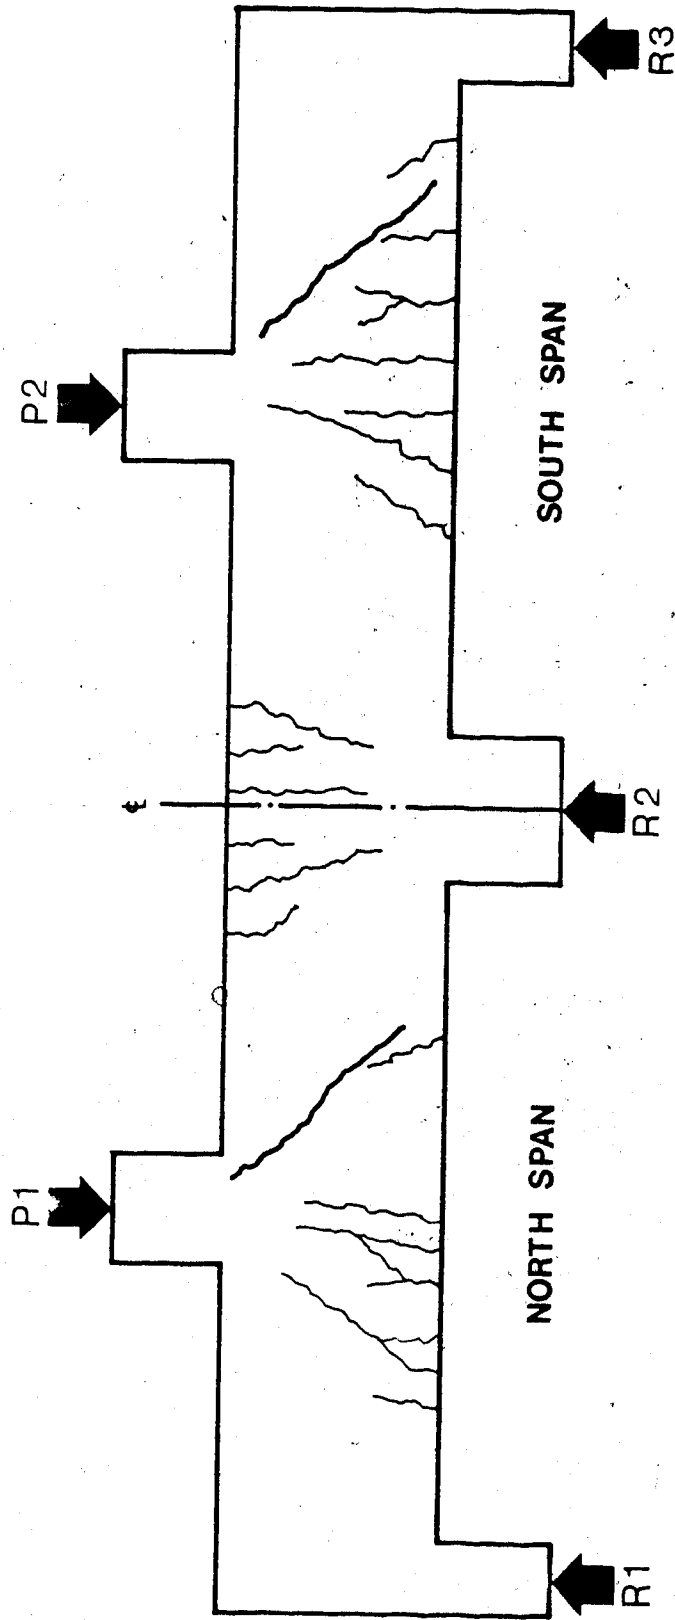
First Inclined Cracking Pattern of Beam No. 1
